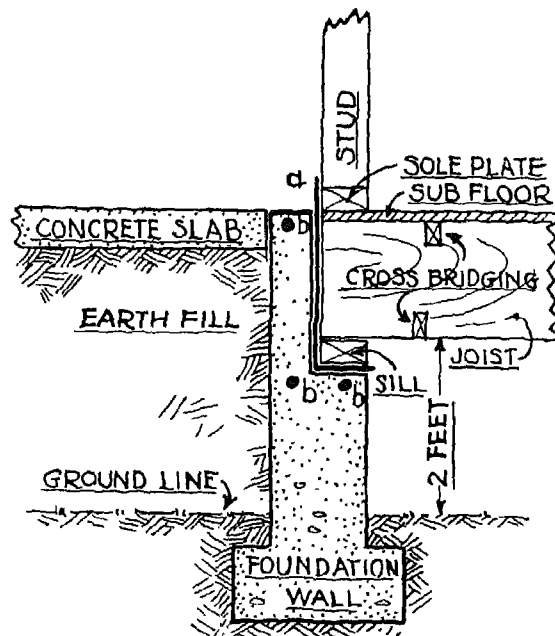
CONCRETE FOUNDATION TREATMENT
